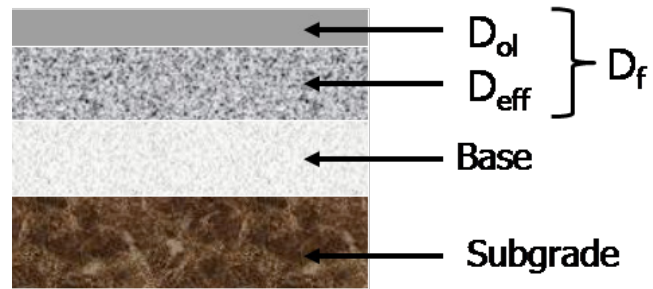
Illustration of Bonded Overlay of Existing Concrete Pavement.
